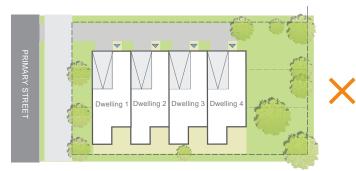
Undesired development, dwellings not orientated towards the street frontage
